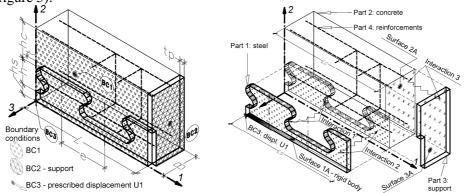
Structure of simple FE model of shear connector (single connector embedded in concrete)
